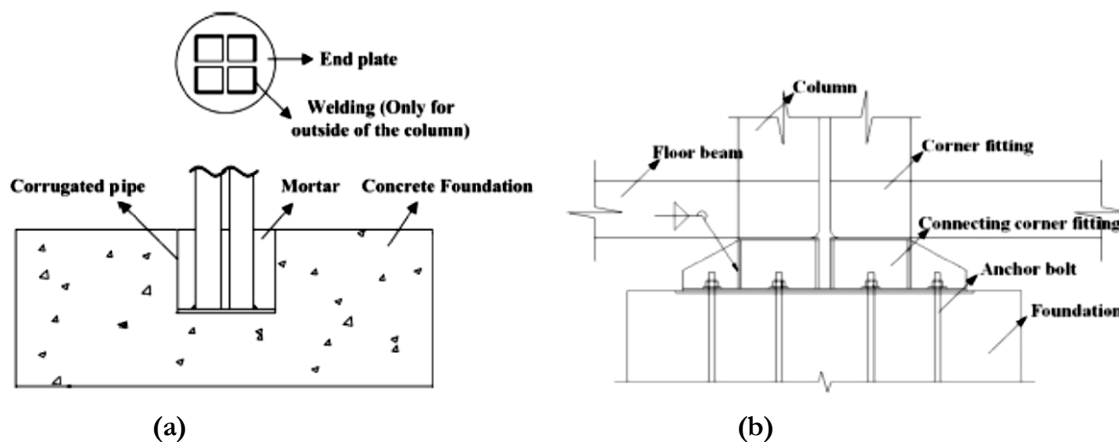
(a) Column-to-foundation embedment connection for interior column of modular unit (Park et al., 2016) [9]; (b) Corner fitting connection (Deng et al., 2020) [6]
